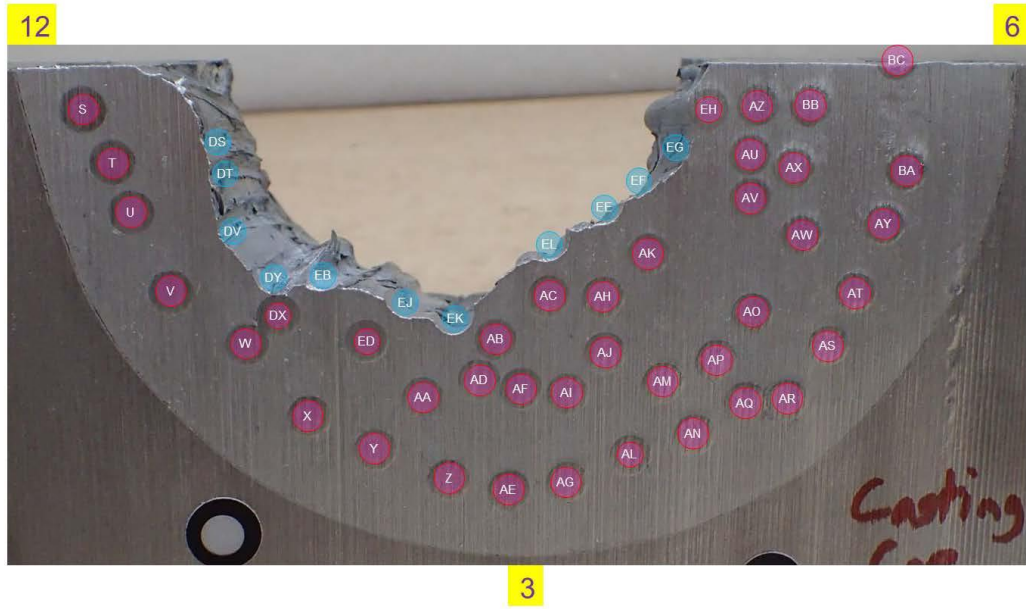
Wire map of the casting cap side of slice 3g. Pink wire labels are wires that fractured within the socket and blue wire labels are wires that remained intact.
